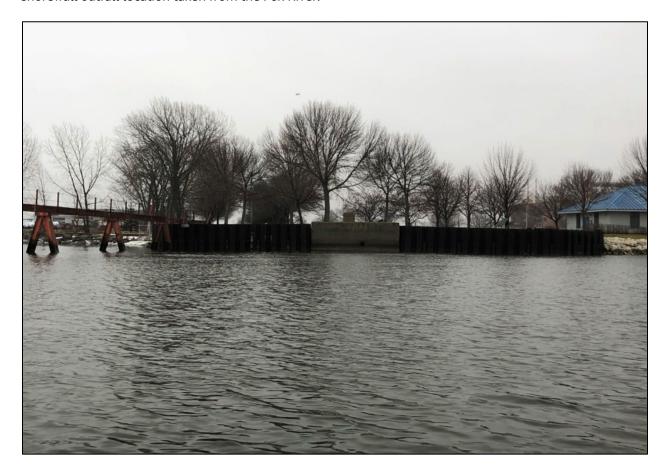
View of the GBF Outfall (Concrete Shorewall)
